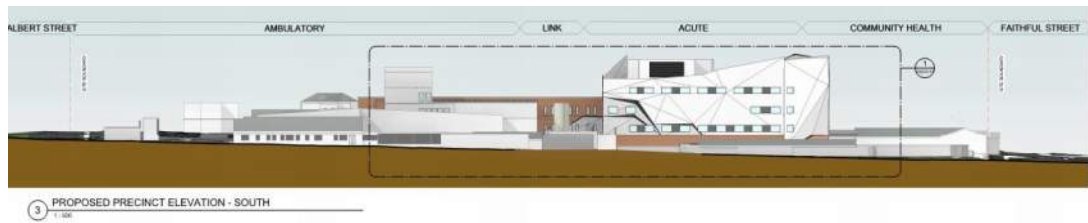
Precinct elevation showing the proposed works viewed from the south (Source: BLP)
